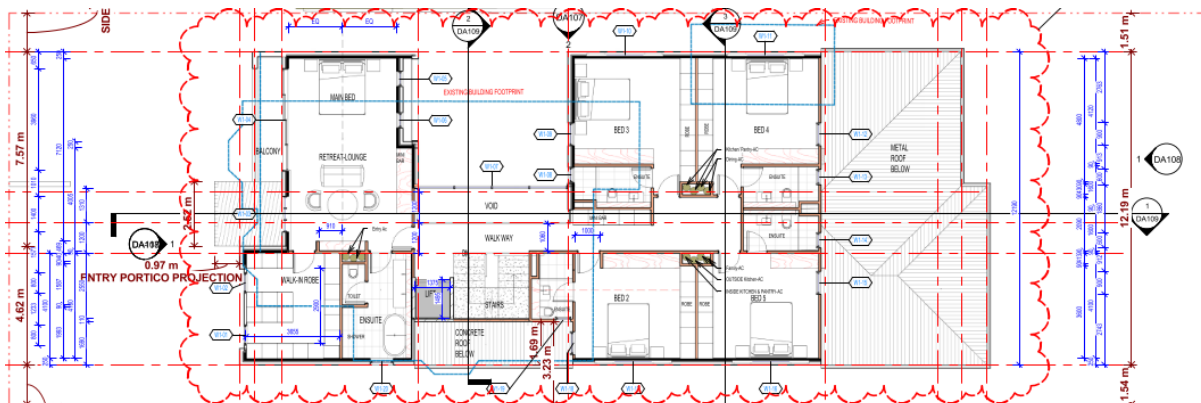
Extract of the proposed first floor plan, drawing # DA105, revision B, dated 16/06/2021 (source: Licon Consulting).
